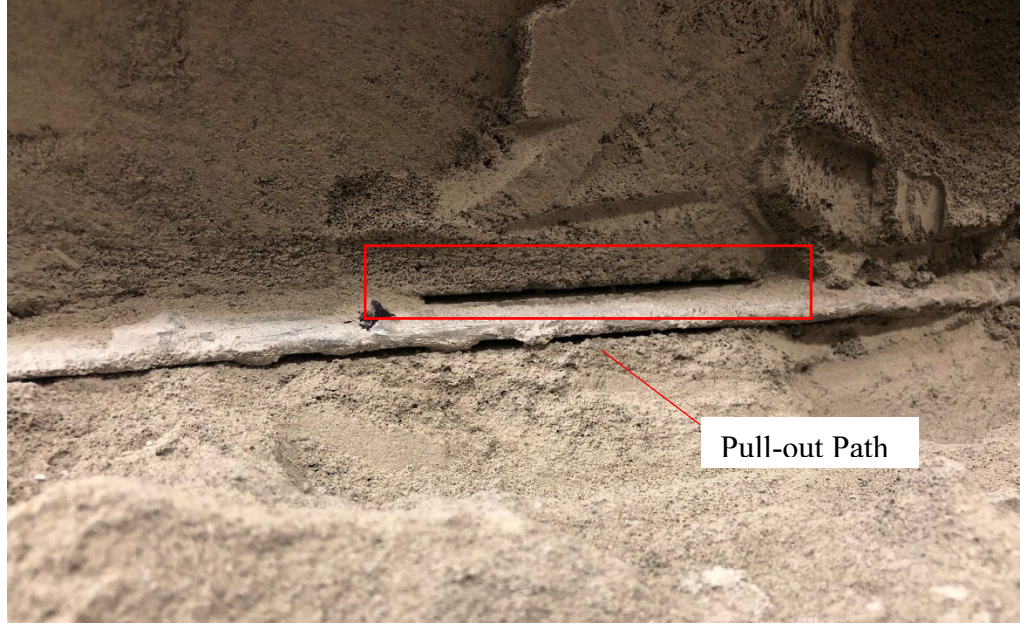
Photograph showing gaps in LCC behind ribs on strip reinforcements after pullout test.
